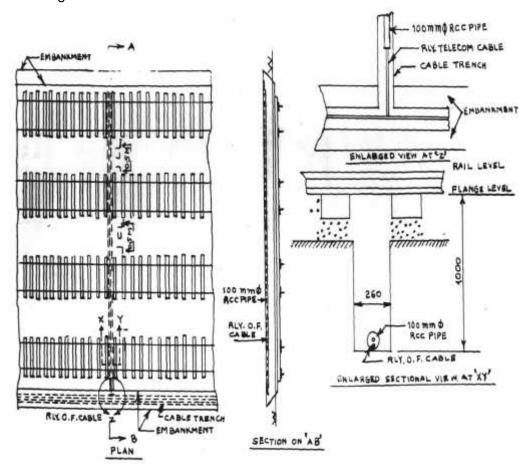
Drawing for track crossing, road crossing, on platform is shown below as per drawing no. RDSO/TCDO/COP-19
